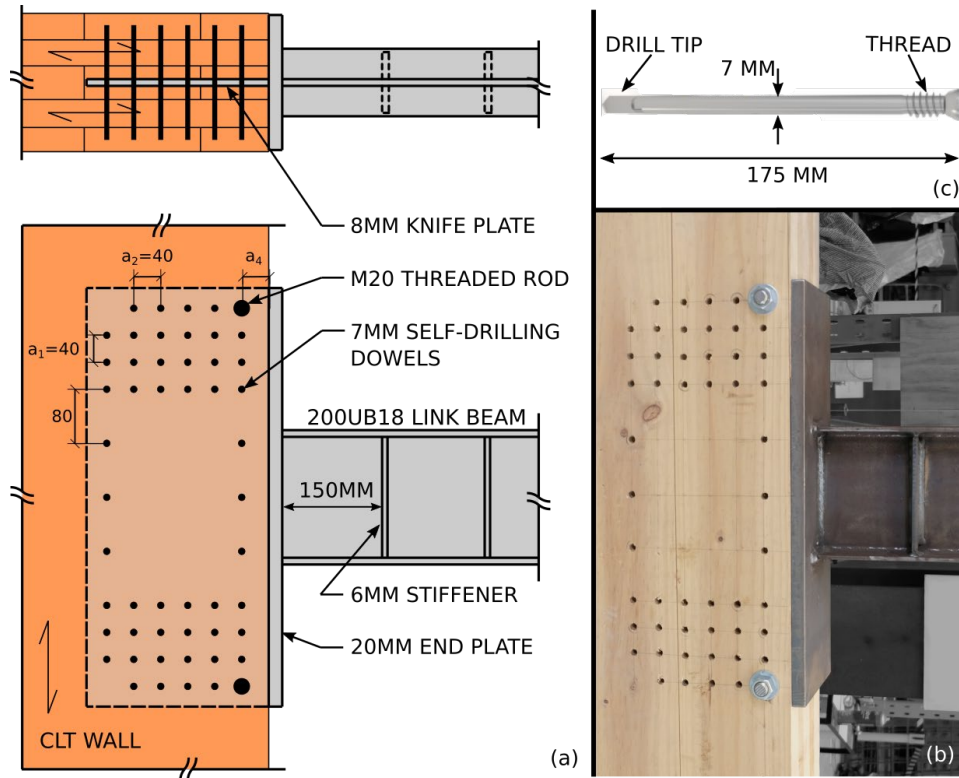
Connection between steel link beam and CLT wall (a, b) with self-drilling dowels (c).
